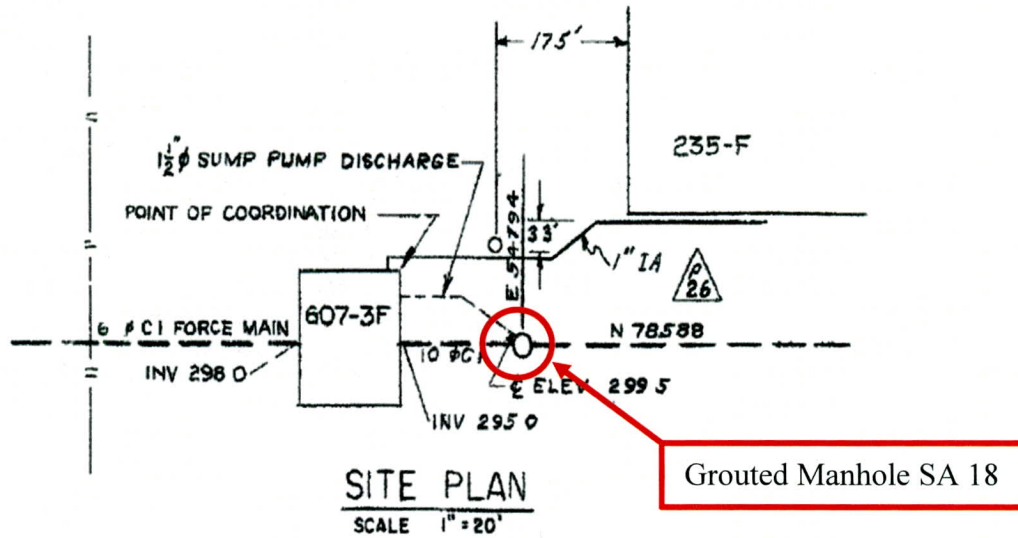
Site plan location of Building 235-F relative to 607-3F Sewage Lift Station
